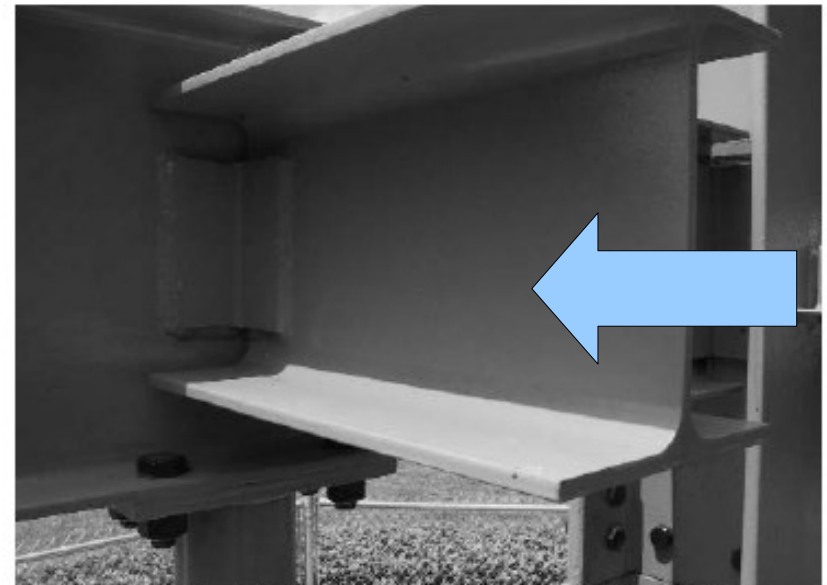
Shear Connection: All-welded double-angle
